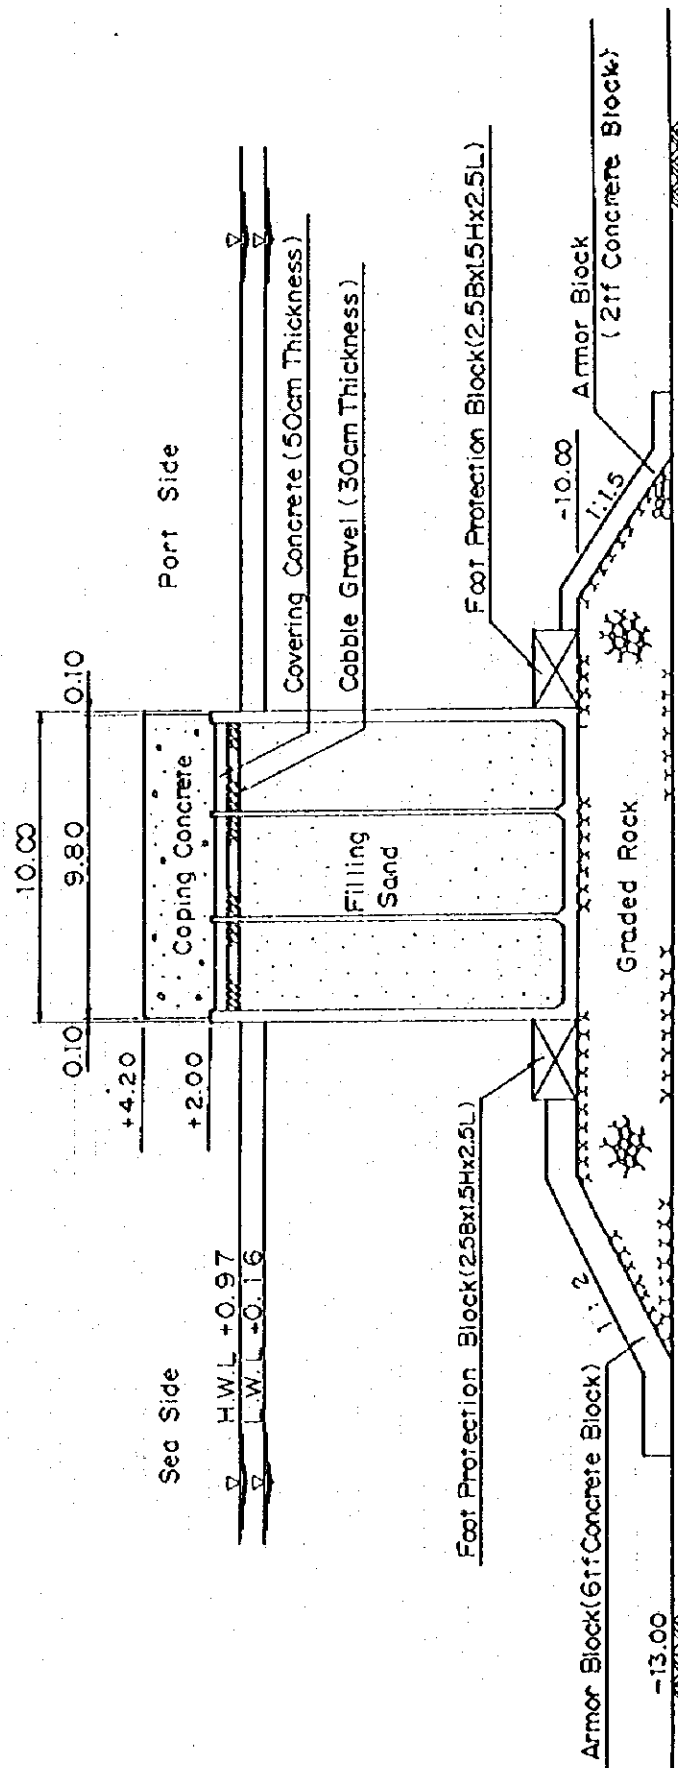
Standard Cross Section of Concrete Caisson Type B Inner Breakwater ⑥
